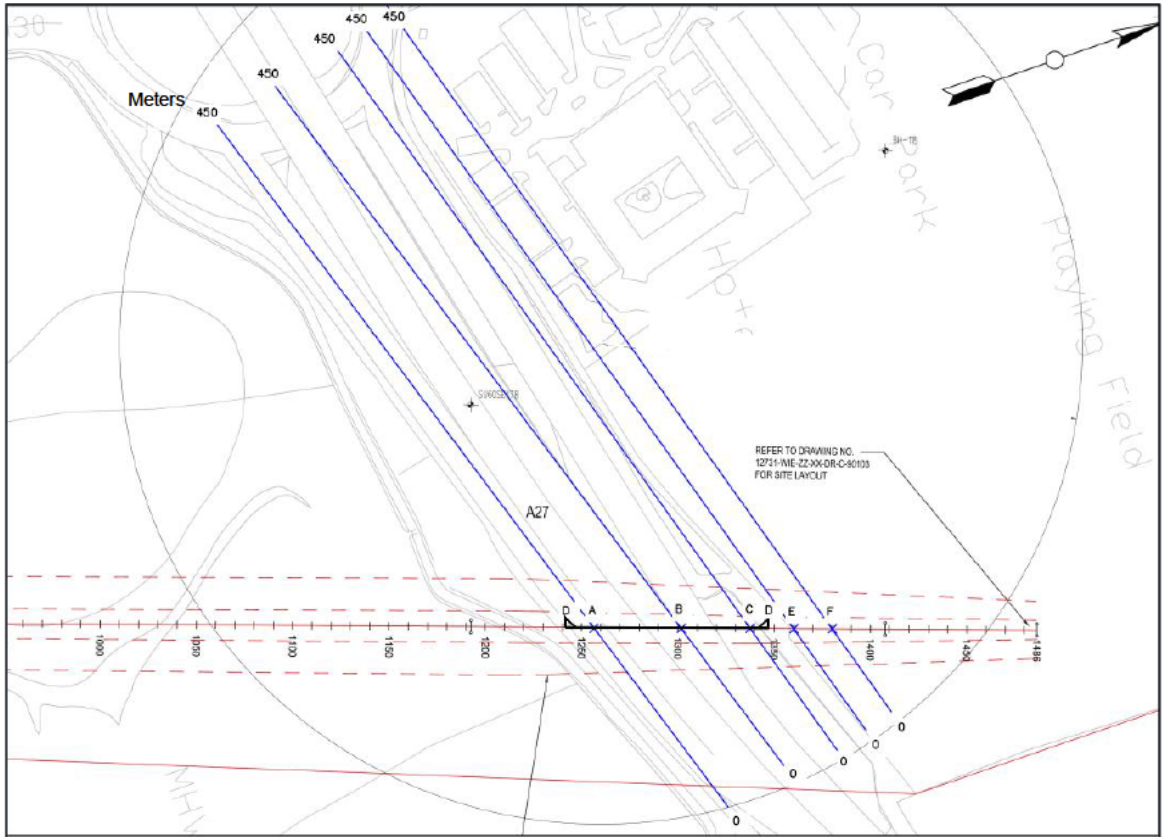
A27 Plan Showing Section Lines Through Each Point A, B, C, E and F.
